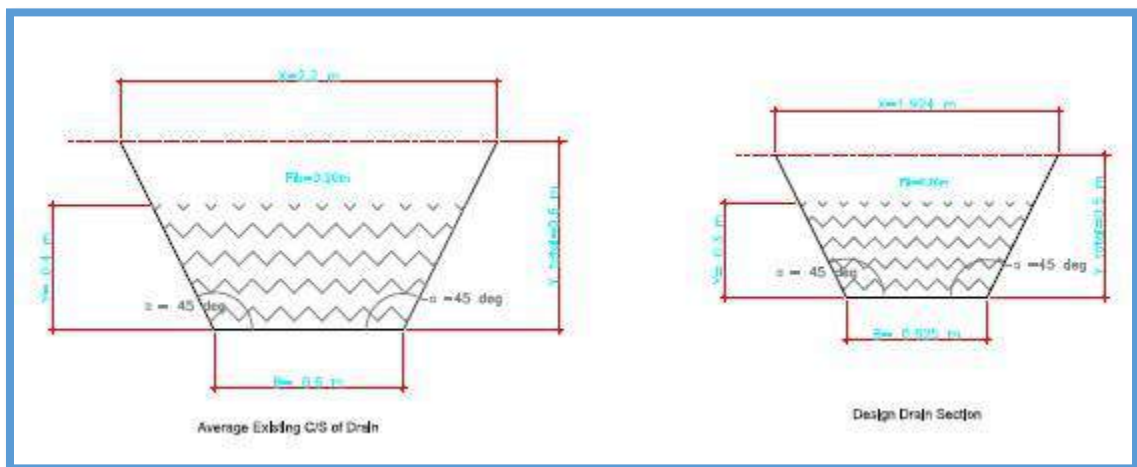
Typical Drain Cross Section for Perseverance Roadside Earthen Drains
